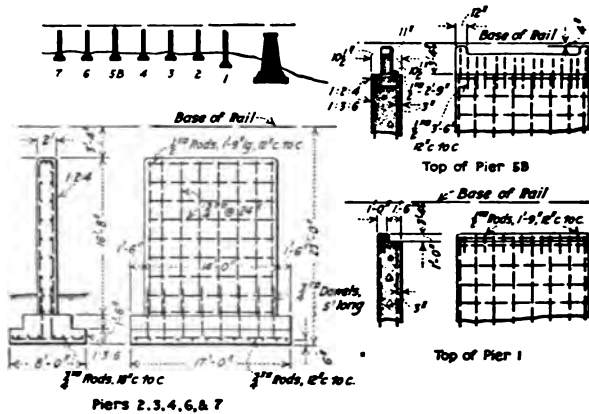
Pier details, Illinois Central R. R. trestle over Kaskaskia River near New Athens, Ill.
